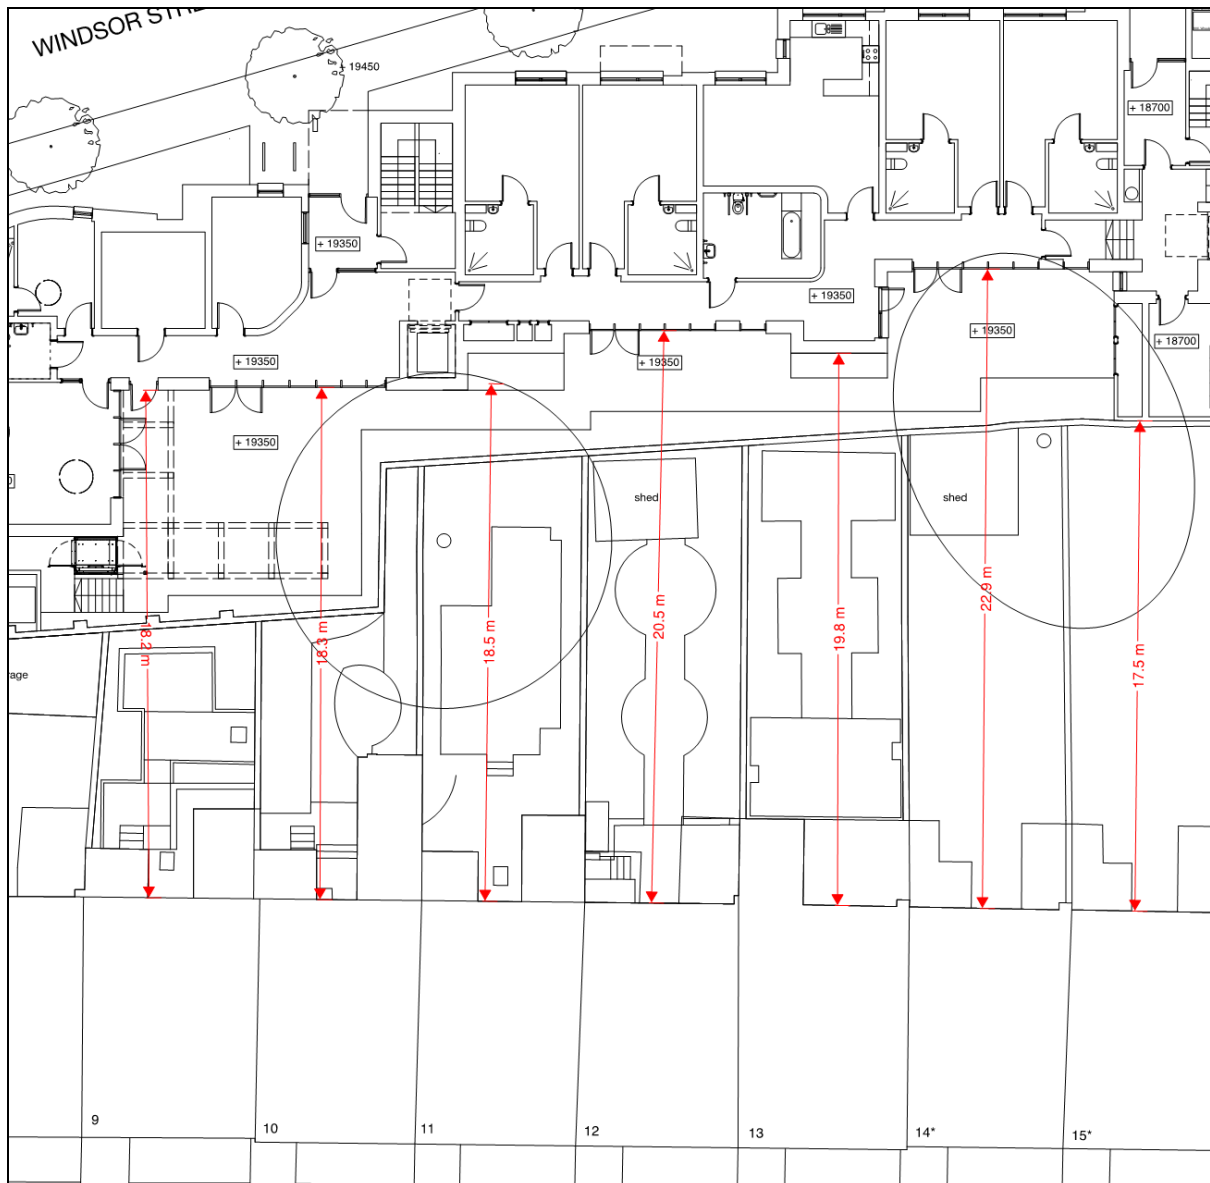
Showing distances between rear windows of Packington Street properties and rear windows of proposed building.
